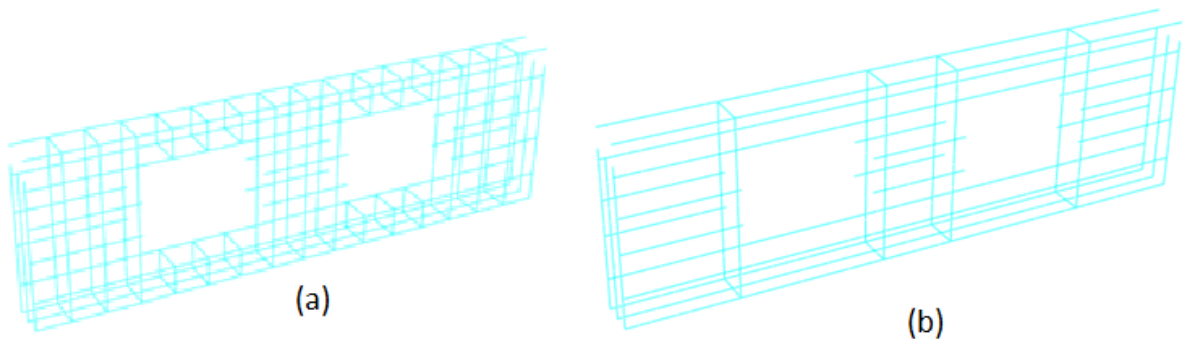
(a)Full steel bar with opening ,(b) No shear full face strenght UHPC
